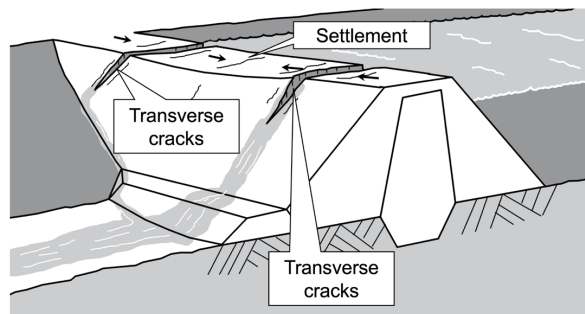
Freeboard loss due to cracks. Differential settlements in the foundation and embankment can cause transverse cracks, resulting in a loss of clearance and favouring the opening of a breach in the dam (He et al., 2021; Fell, 2015).
